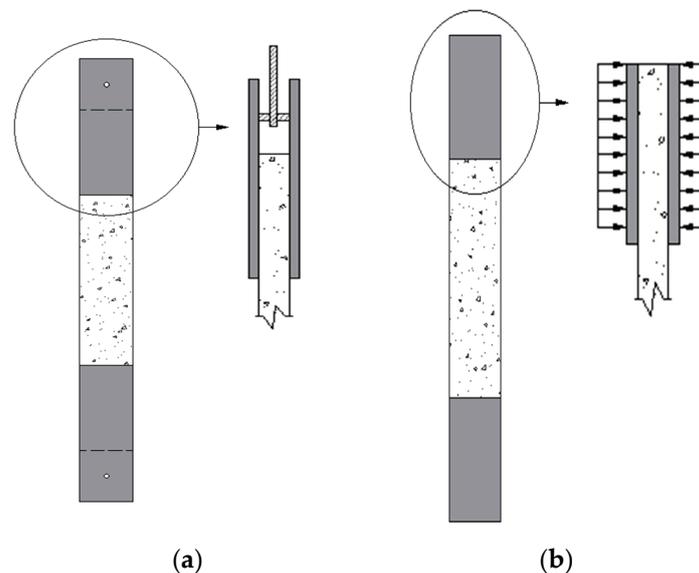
Sketch of (a) clevis-grip and (b) clamping-grip uniaxial tensile test set-ups.
